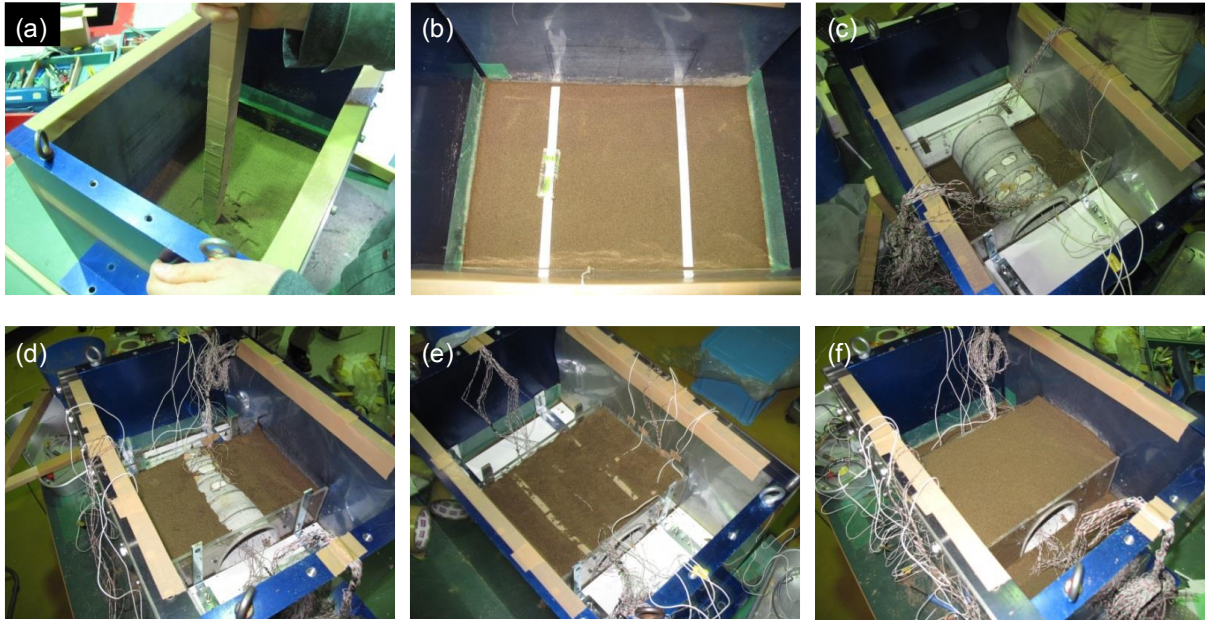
Procedure for making embankment model with culvert: (a) compaction of foundation ground with wooden rectangular tamper, (b) setting foundations for wall model, (c) setting culvert model and mouth wall, (d) backfilling around culvert model, (e) attachment of reinforcing members, and (f) completion of embankment model with culvert and mouth wall.
